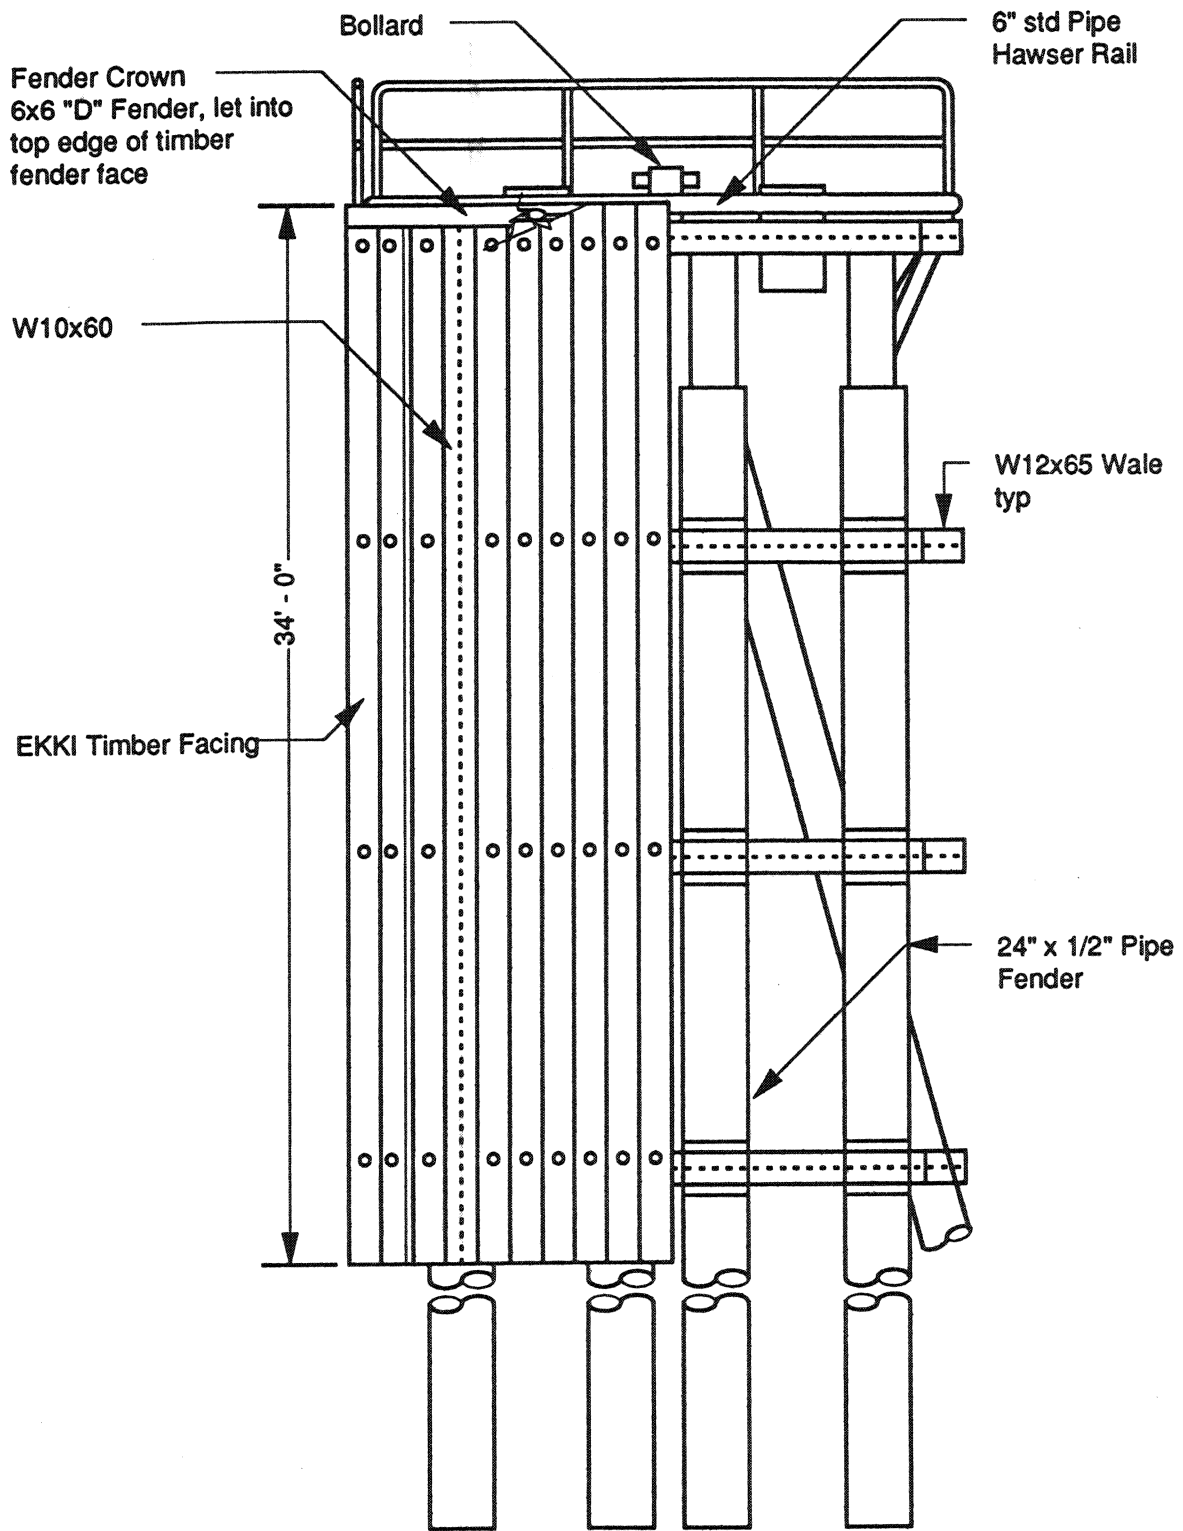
Front Elevation of Mooring Structure – Ketchikan, Alaska
